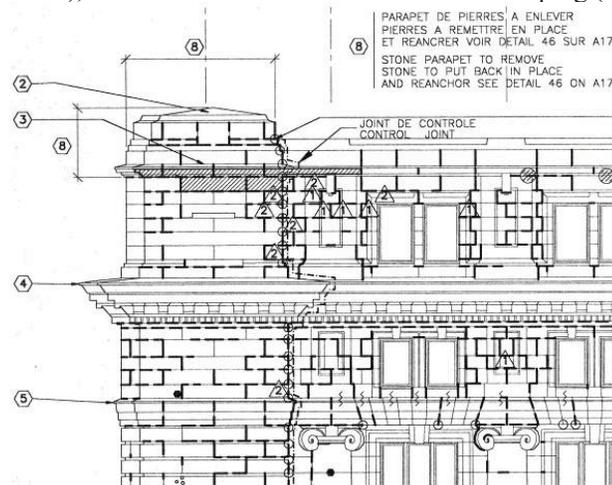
Parapet to be dismantled on the southwest corner of 400 place d'Youville south façade (from page A01).
